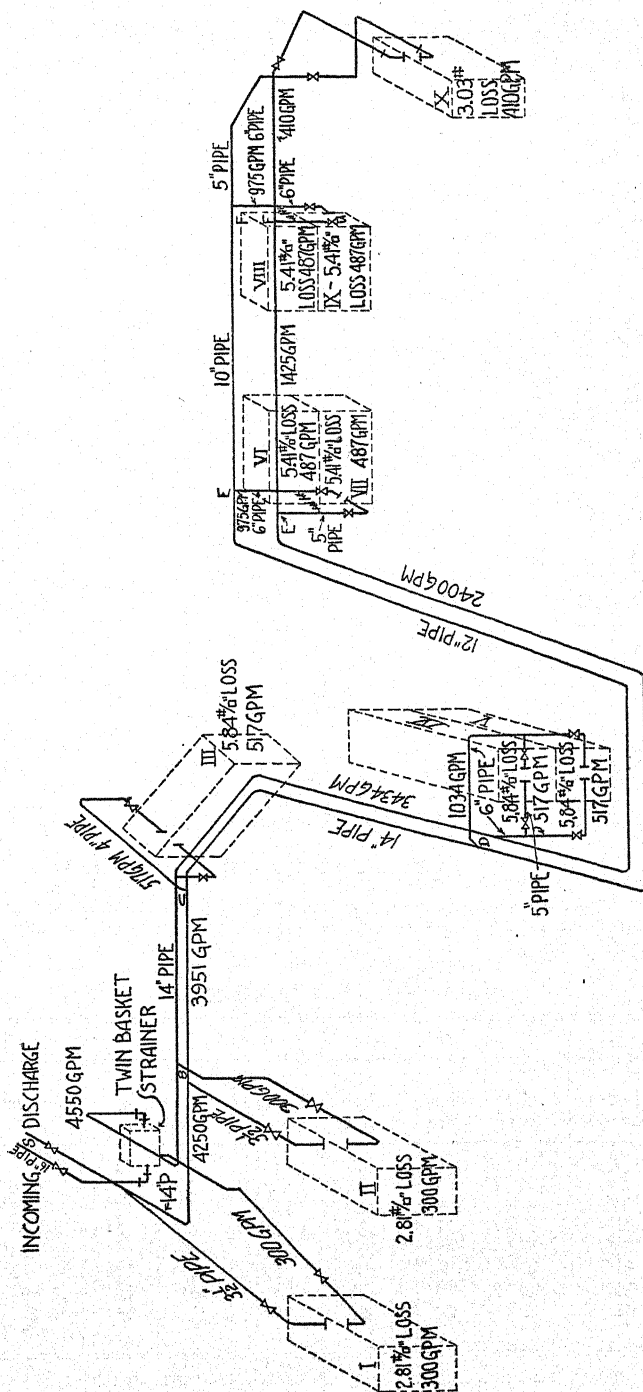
Schematic diagram, arc welded and flanged system.
